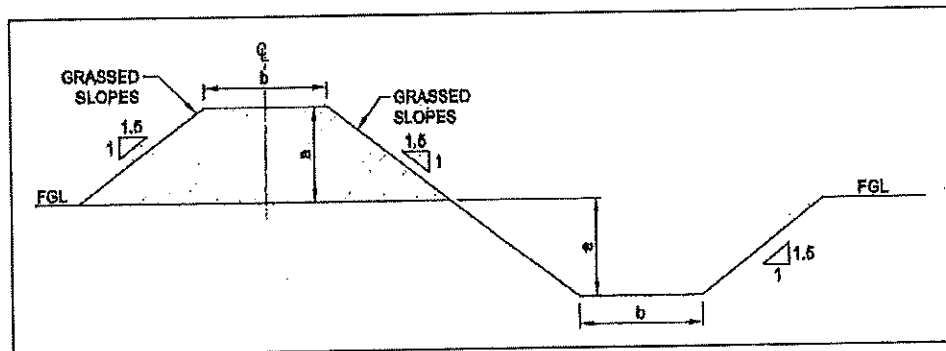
EXAMPLE OF TYPICAL CROSS-SECTION THROUGH CLEAN STORMWATER DIVERSION
